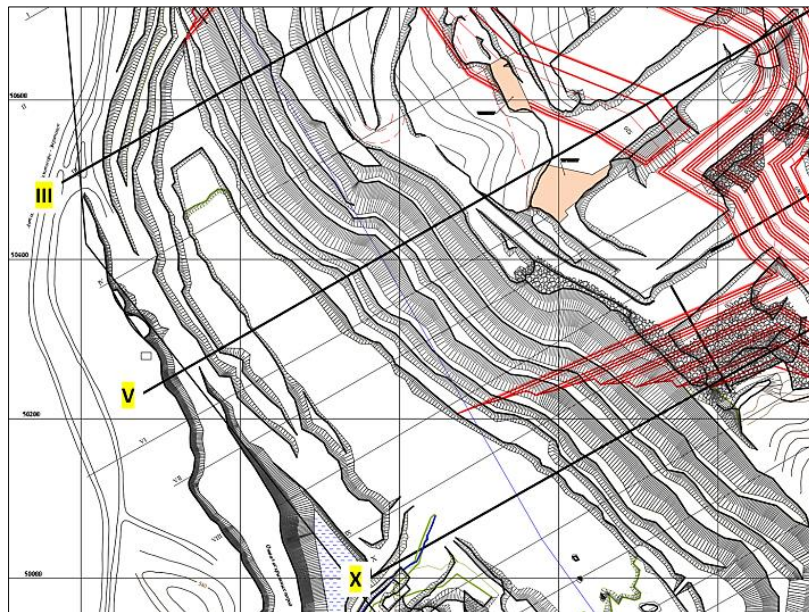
Actual Position of the Northeast Pit Wall along Sections III, IV, and X
